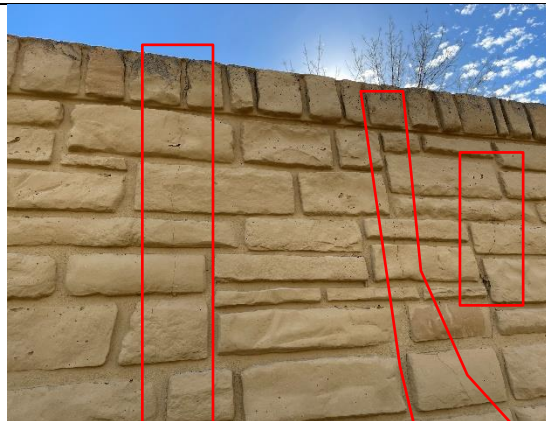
Vertical cracks in exterior of panel 10. (annotated by Lerch Bates).
